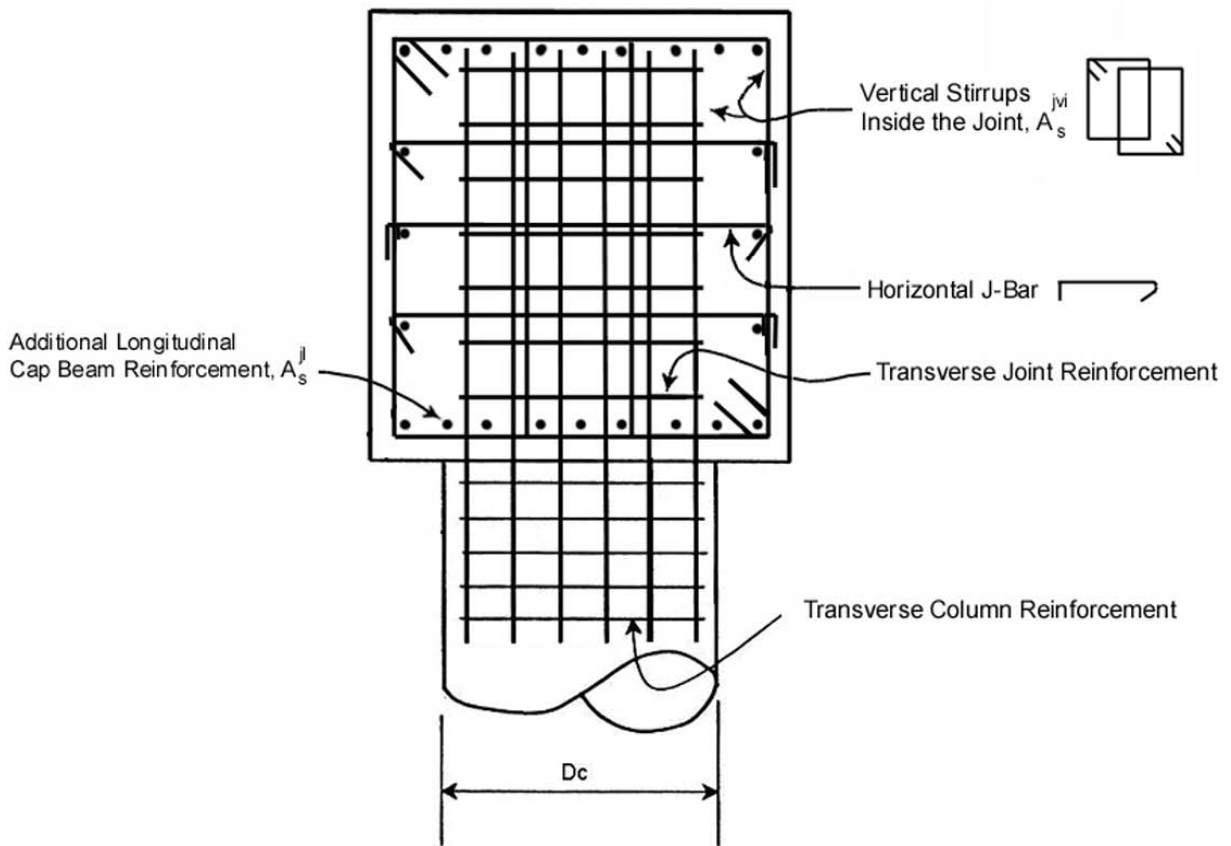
Joint Shear Reinforcement Details
